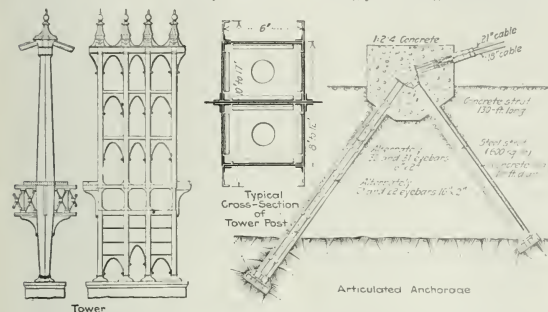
Windsor-Detroit Bridge, Portal-braced tower and street-and-tie anchorage.
